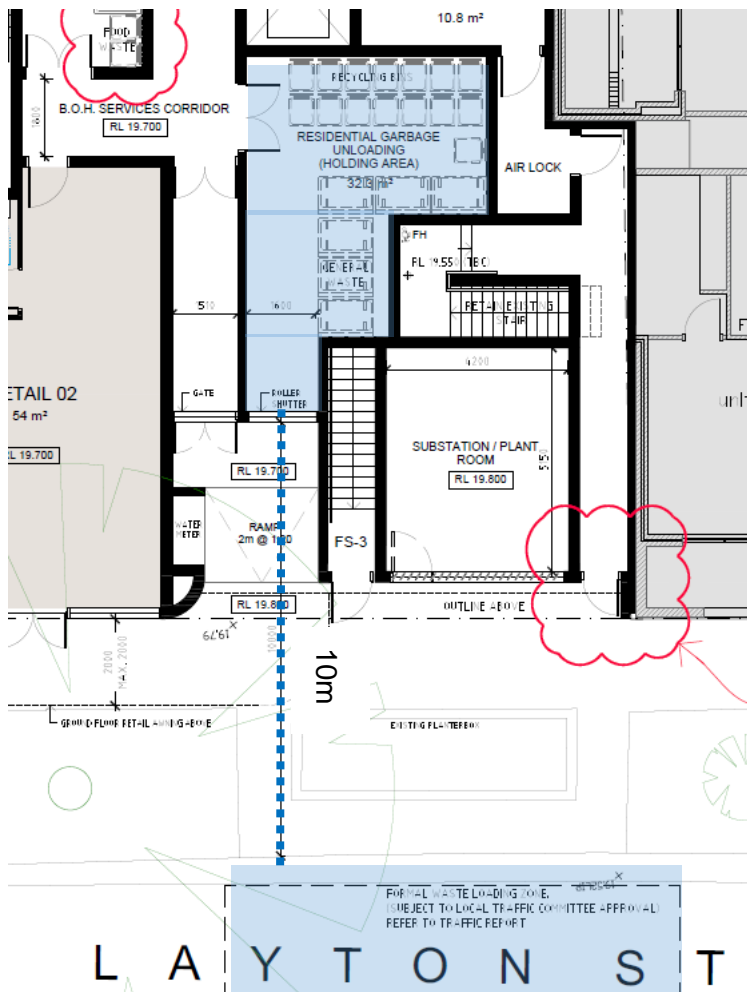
illustrating the residential garbage unloading and holding area, and the 10m path of travel to the proposed waste collection loading zone
